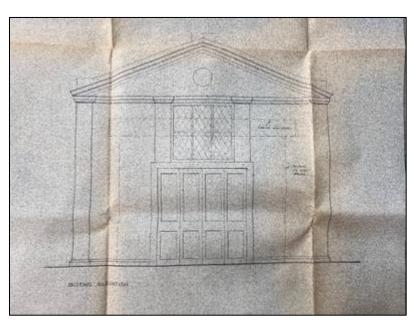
Existing south elevation of 12A park Village West as per drawing 40/10 by John Burkett ARIBA, 1958 (National Archive Ref CRES 35/3545)
